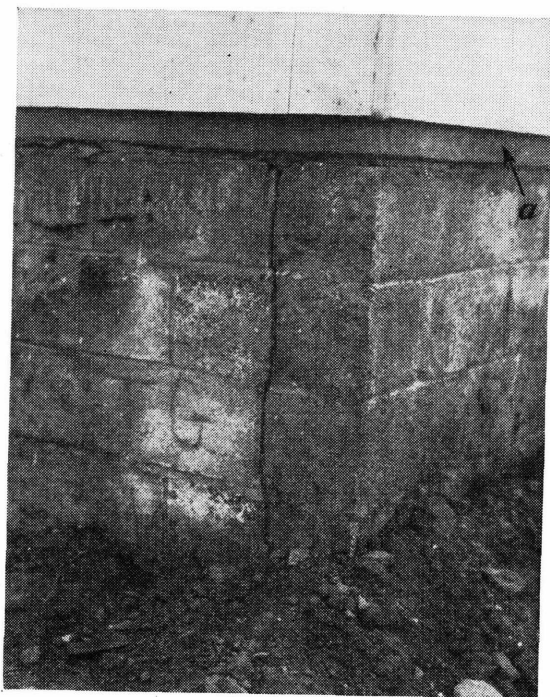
Reinforced poured-concrete floor slab (arrow) extending over and to the outer surface of a masonry foundation, preventing hidden termite attack, even though a vertical crack has developed in the wall.
